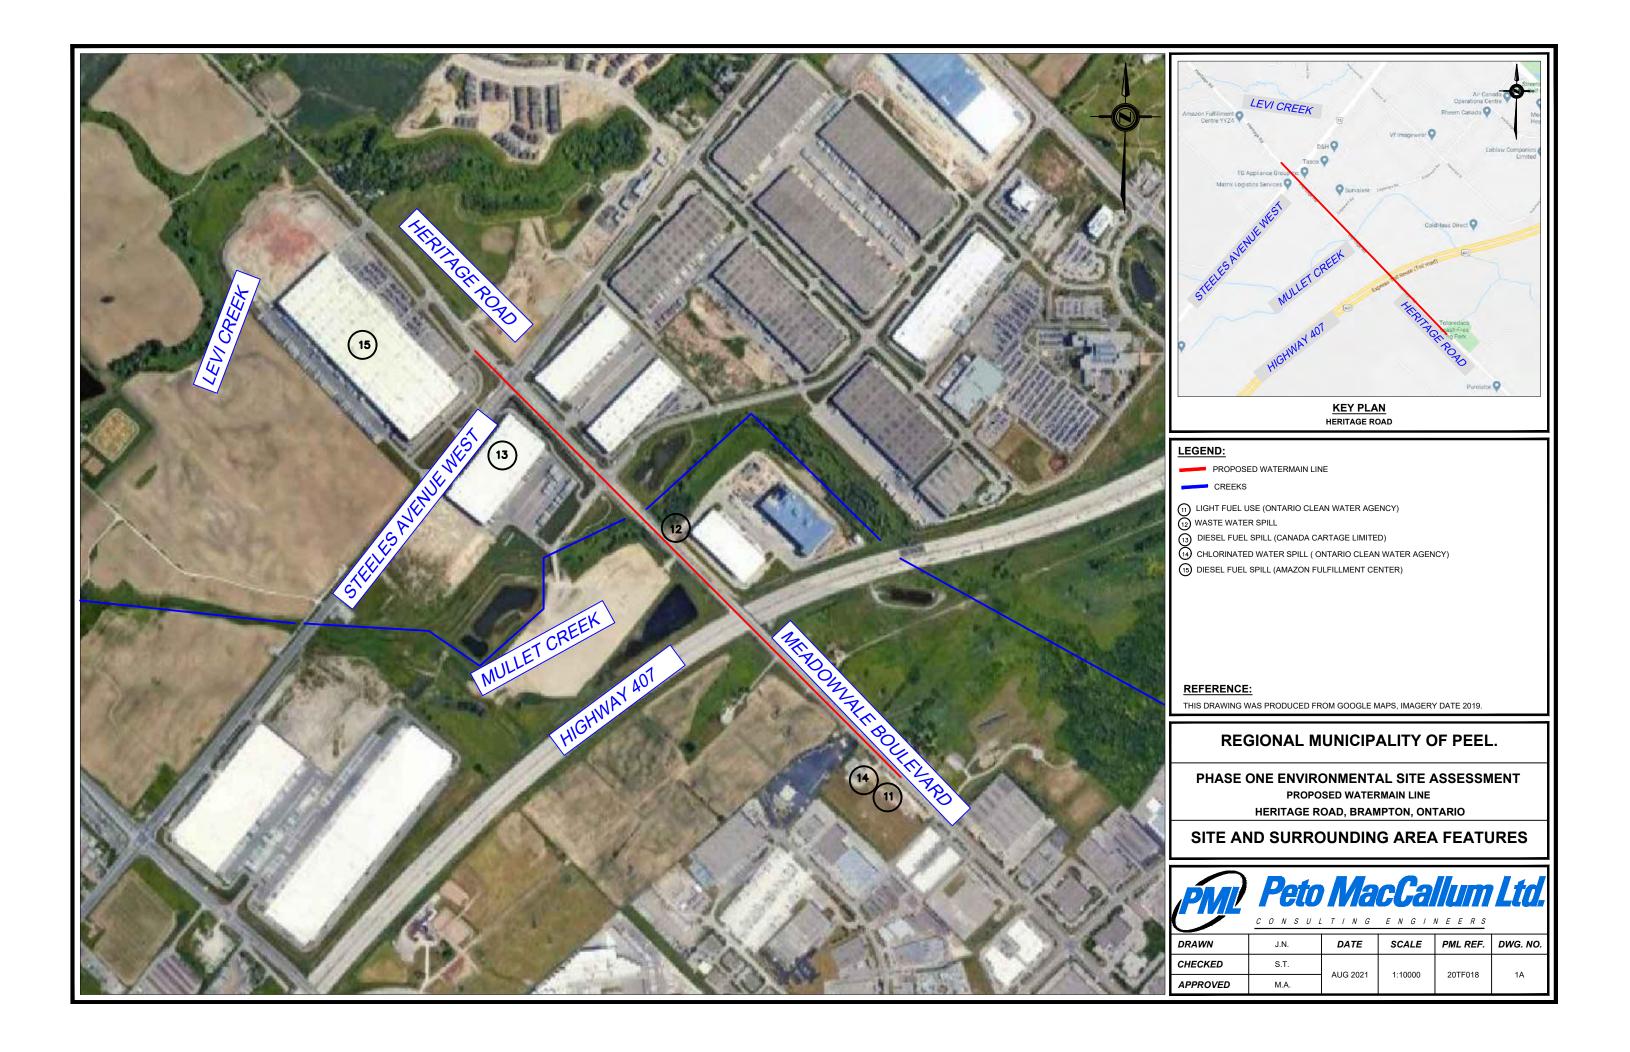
The Site at Heritage Road and Steeles Avenue West intersection.
